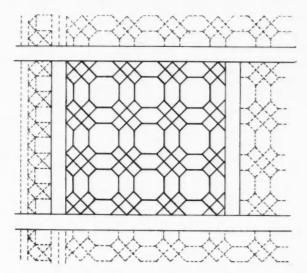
Method of Laying Ornamental Tile Floor-Top View
